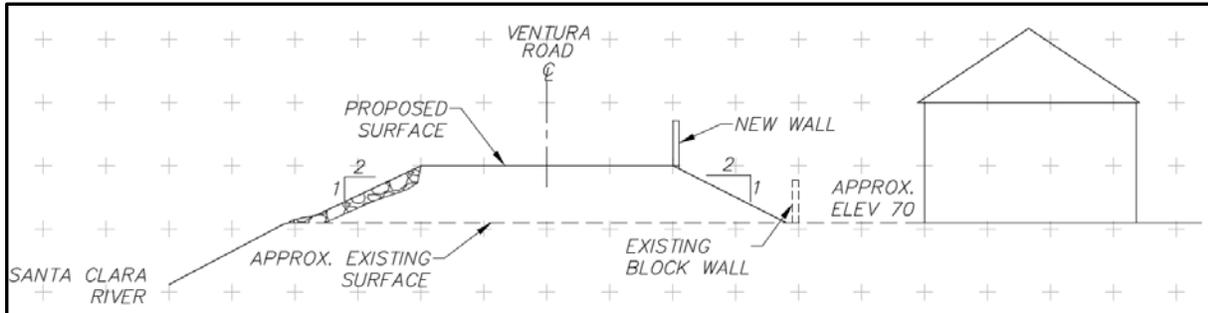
Cross-section at east end of N. Ventura Road with Raised Roadway (VCWPD, 2014)
